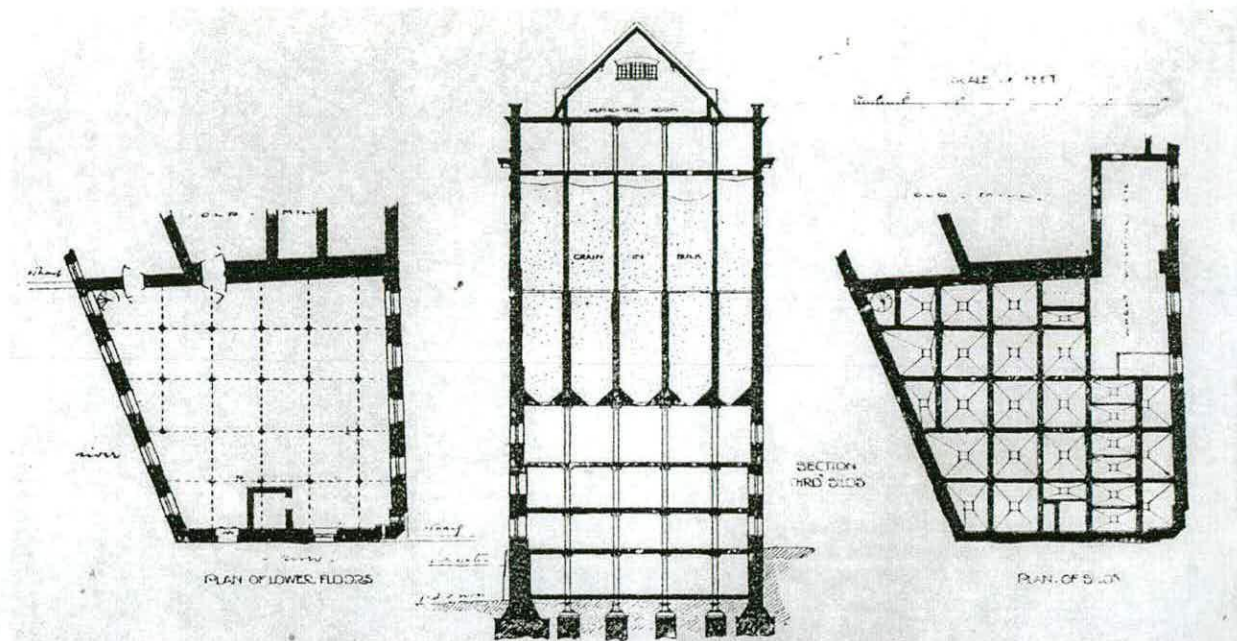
Webb's plan and section of the Silo building. (from *Academy Architecture No.12* (1897), 82).
